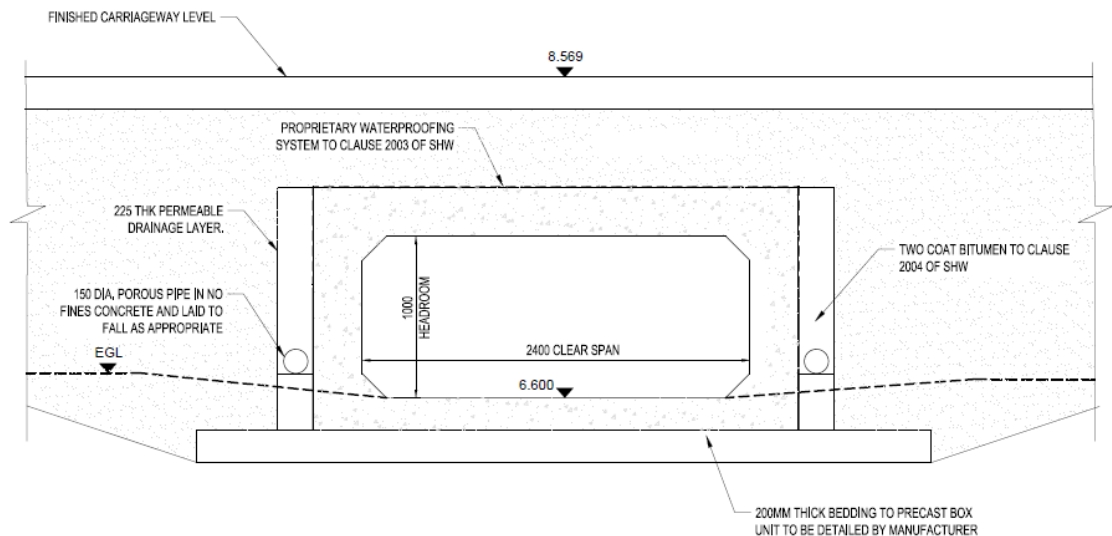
Cross-section of the proposed flood relief culvert at crossing 7 (extract from drawing no. SZC-AD0310-WSP-SLRHDG-ZZ0000-DRW-HCD-300004)
